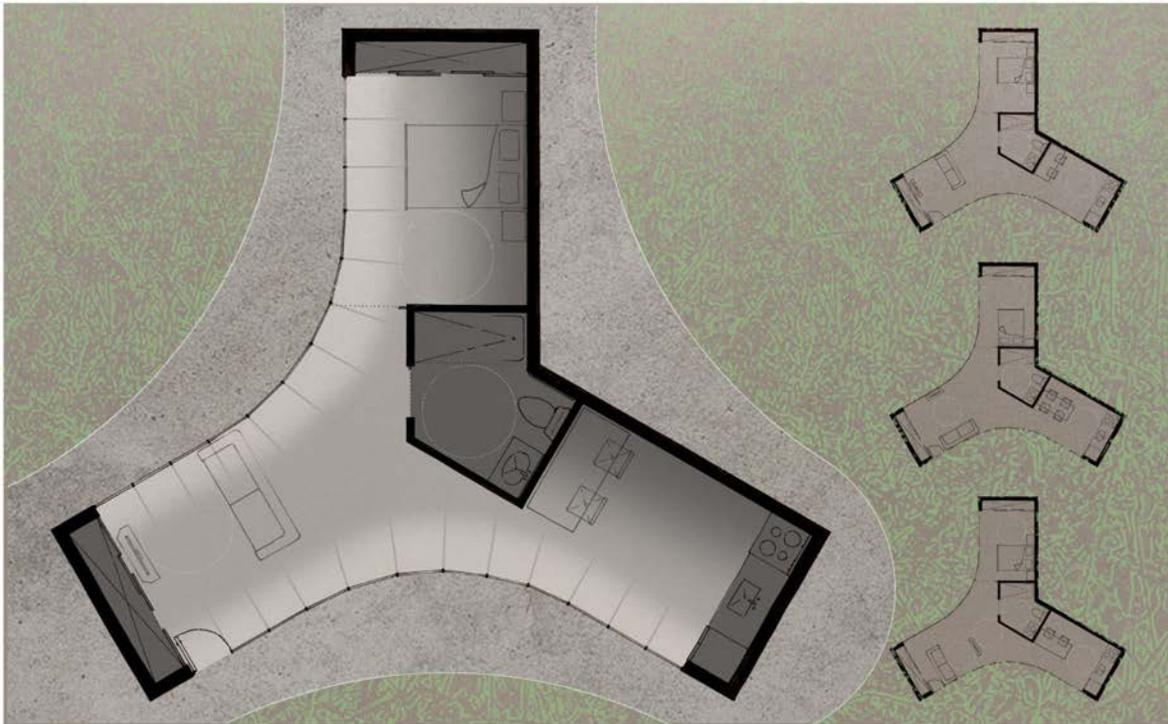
Final floorplan of the *Sapling* with a variety of furnishing options.
